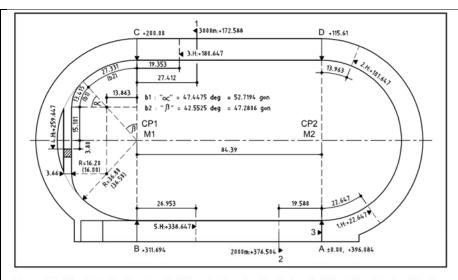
Steeplechase track with water jump inside the bend of the 400m Standard Track (without fixed kerb) (Dimensions in m)
